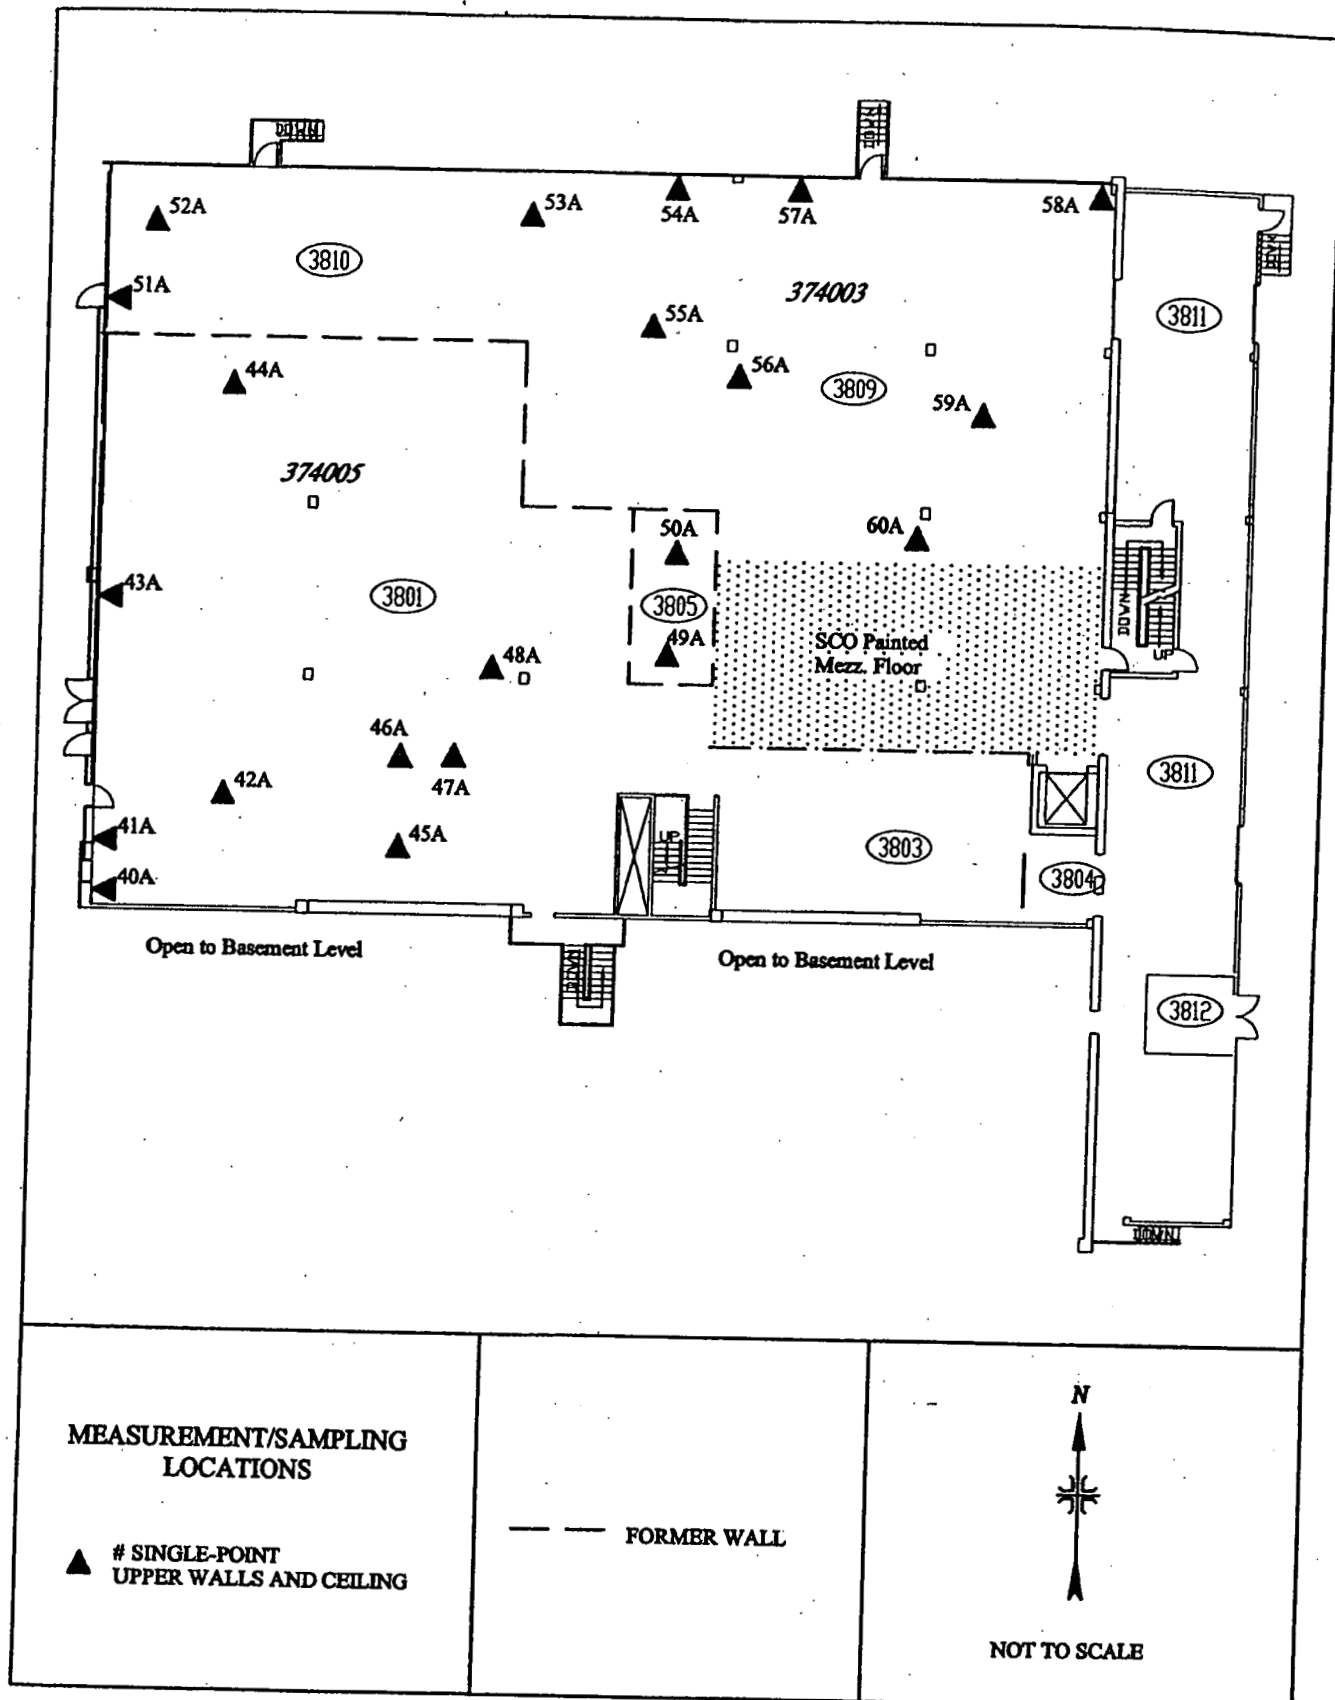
Ground Floor Level - Upper Walls and Ceiling - Measurement and Sampling Locations
